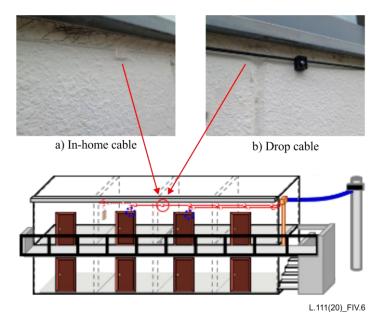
Examples of installation outside under the eaves; (a) in-home cable and (b) drop cable
